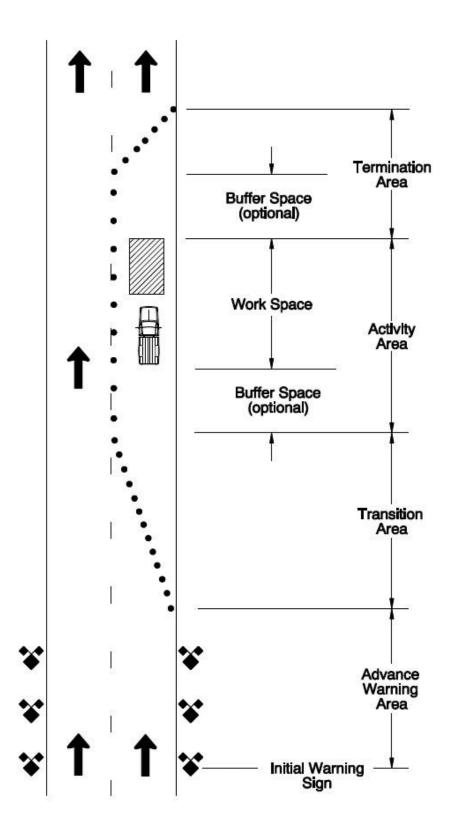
Example work zone layout for single right lane drop (OTTCH, 2011)
